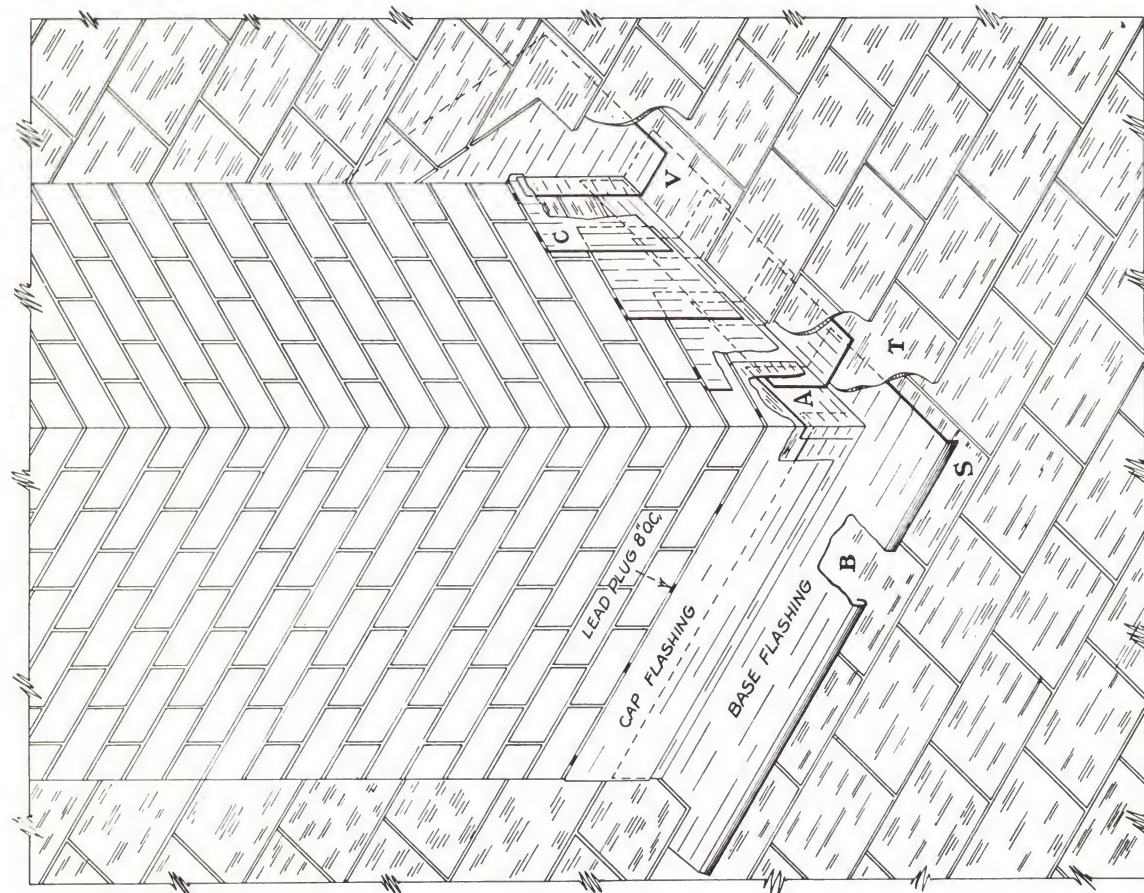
PERSPECTIVE VIEW SHOWING FLASHING AT FRONT AND SIDE OF CHIMNEY FOR SLATE, FLAT TILE AND SHINGLE ROOFS
